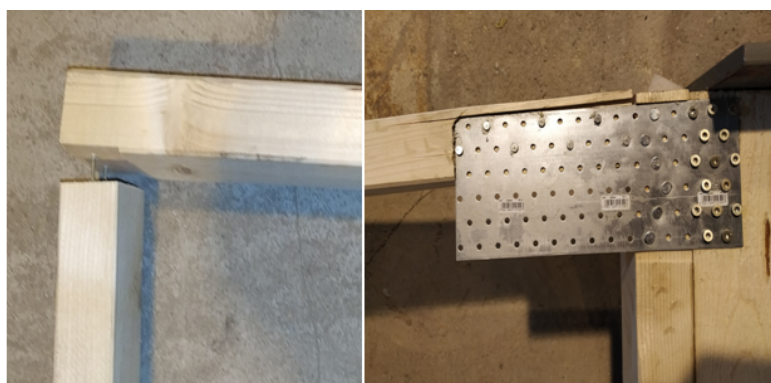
Element with nailed connections after the study (view of cap and foundation connection)
